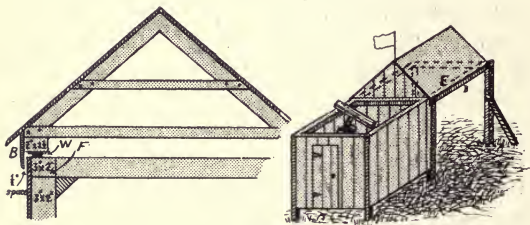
'Run-off' Roof. Section across gable end, and sketch showing 'rails.'
